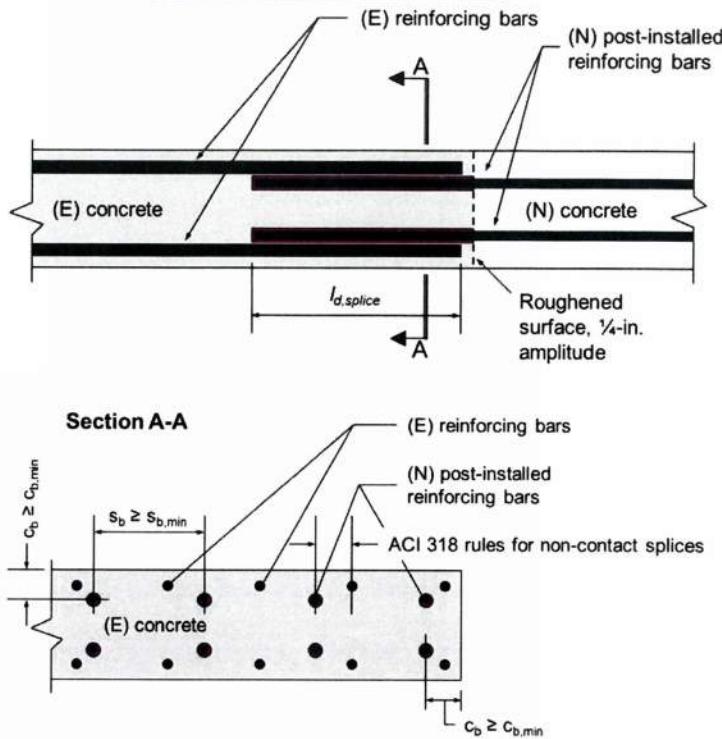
INSTALLATION PARAMETERS FOR POST-INSTALLED REINFORCING BARS
